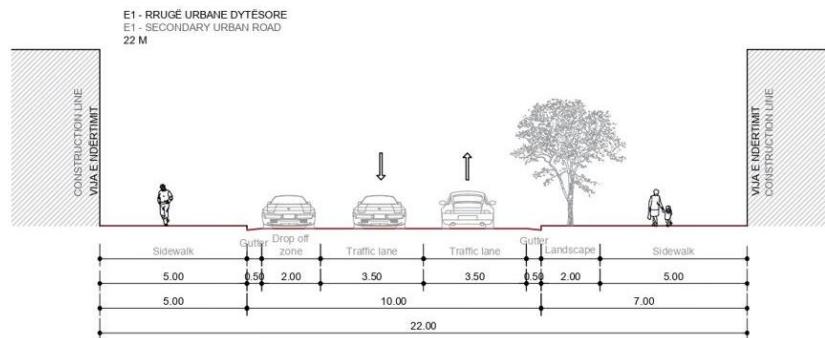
Secondary Urban Road Section (Source: Durrës Port Authority)
